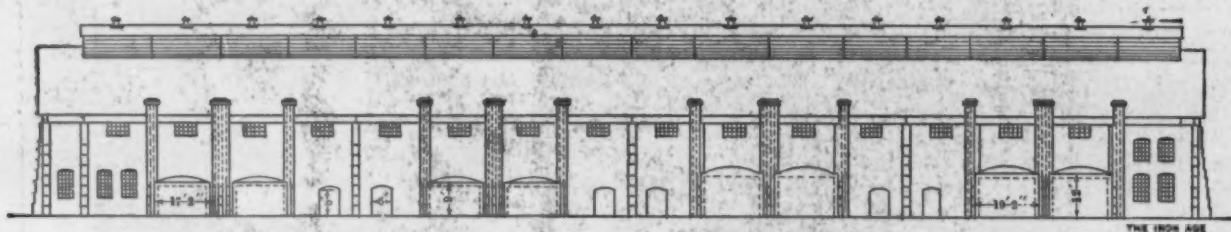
Elevation of North or Core Oven Side of Main Building.
